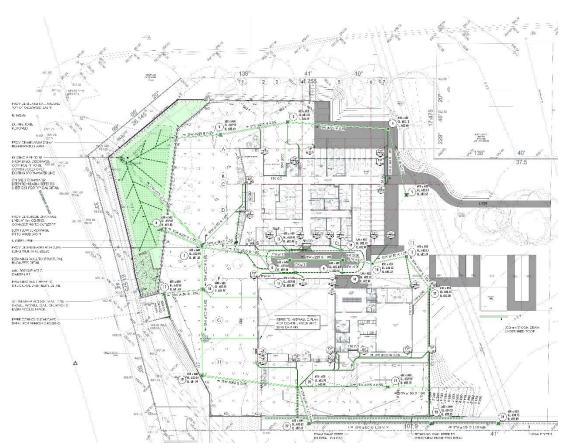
A: Site Stormwater Plan - s.4.55 Modification (source: JN Responsive Engineering)
